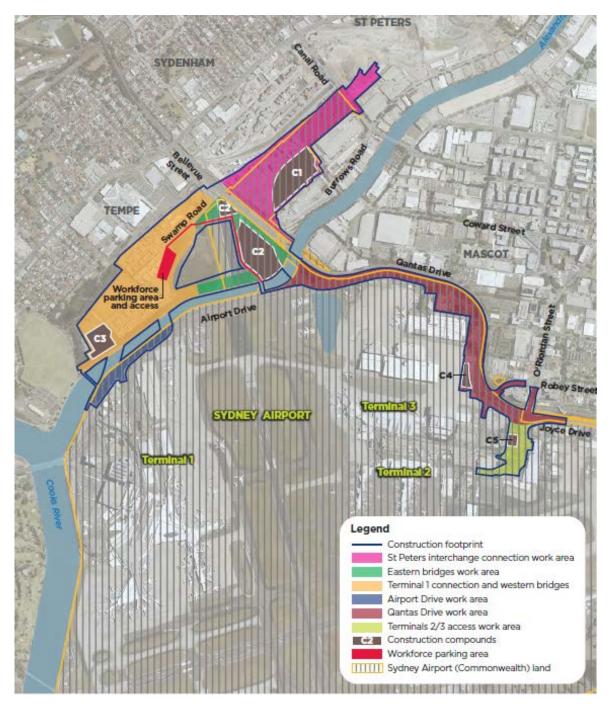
| Construction ancillary facilities and construction footprint (Source: Sydney Gateway Road Project EIS/pdMDP)
